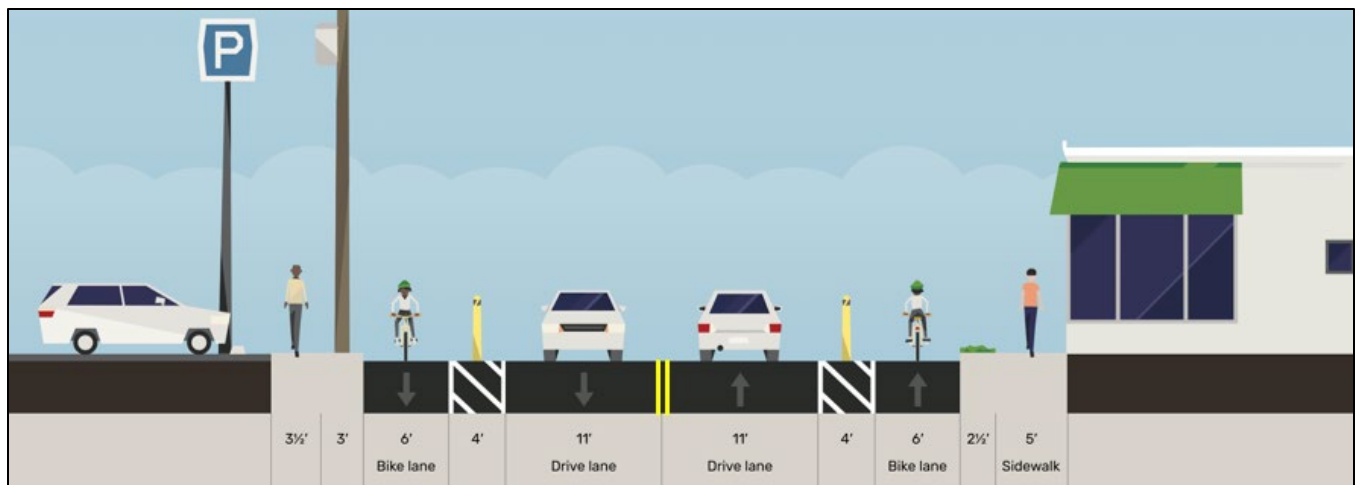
County Road Alternative Cross Section 1 (Retains Existing Curb to Curb Width)
